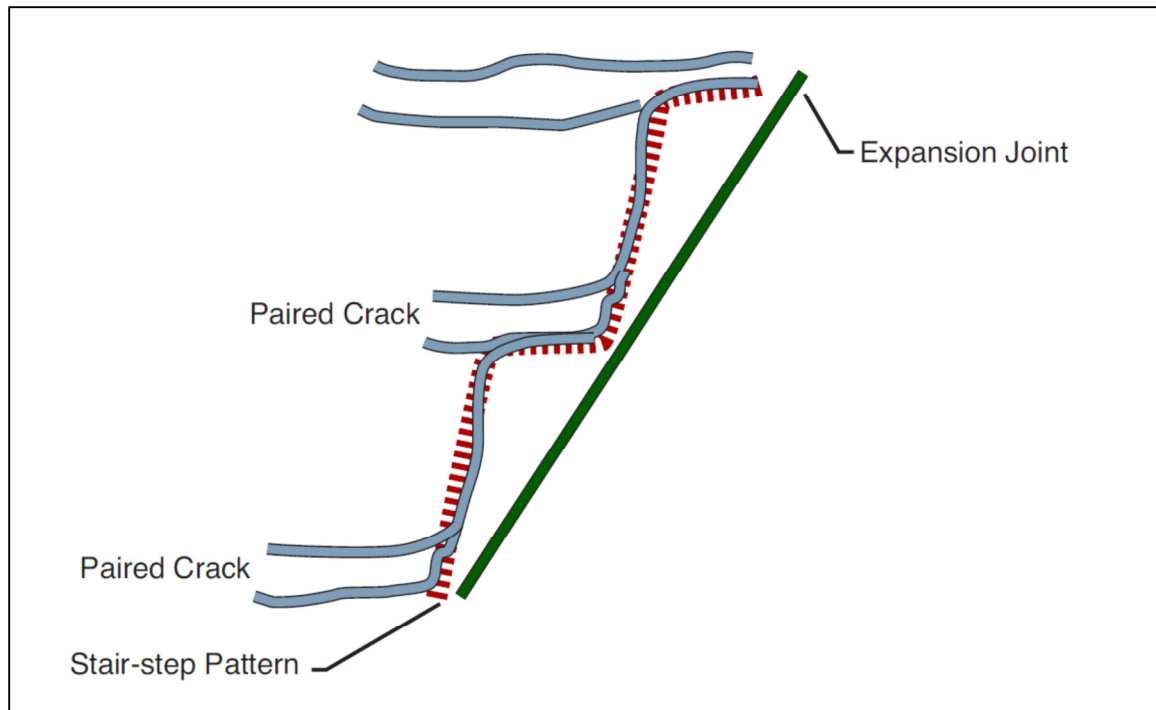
Typical stair step cracking on Louetta Bridge (Folliard, Smith, Sellers, Brown, & Breen, 2003).
